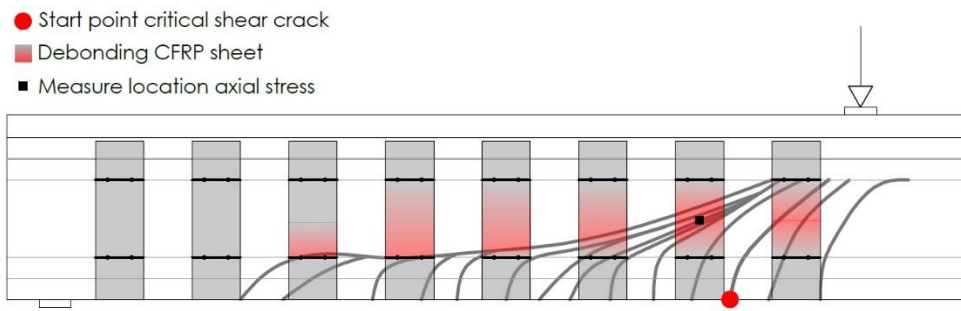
Crack pattern and CFRP debonding specimen I-VA-SP5 at load step 158
